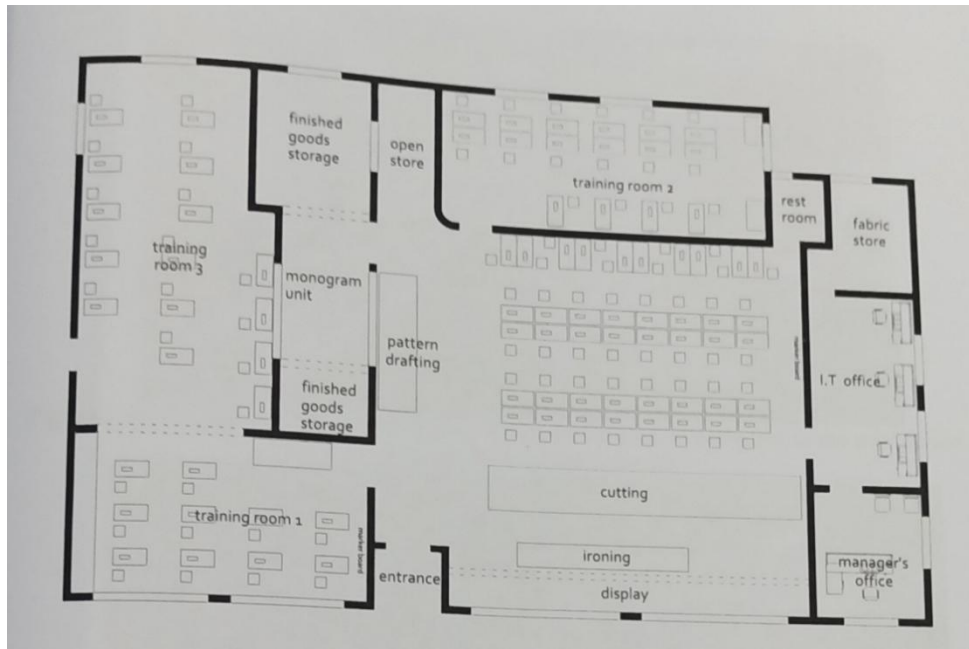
Figure Showing the Floor Plan of One-Stop-Celebration Fashion House
